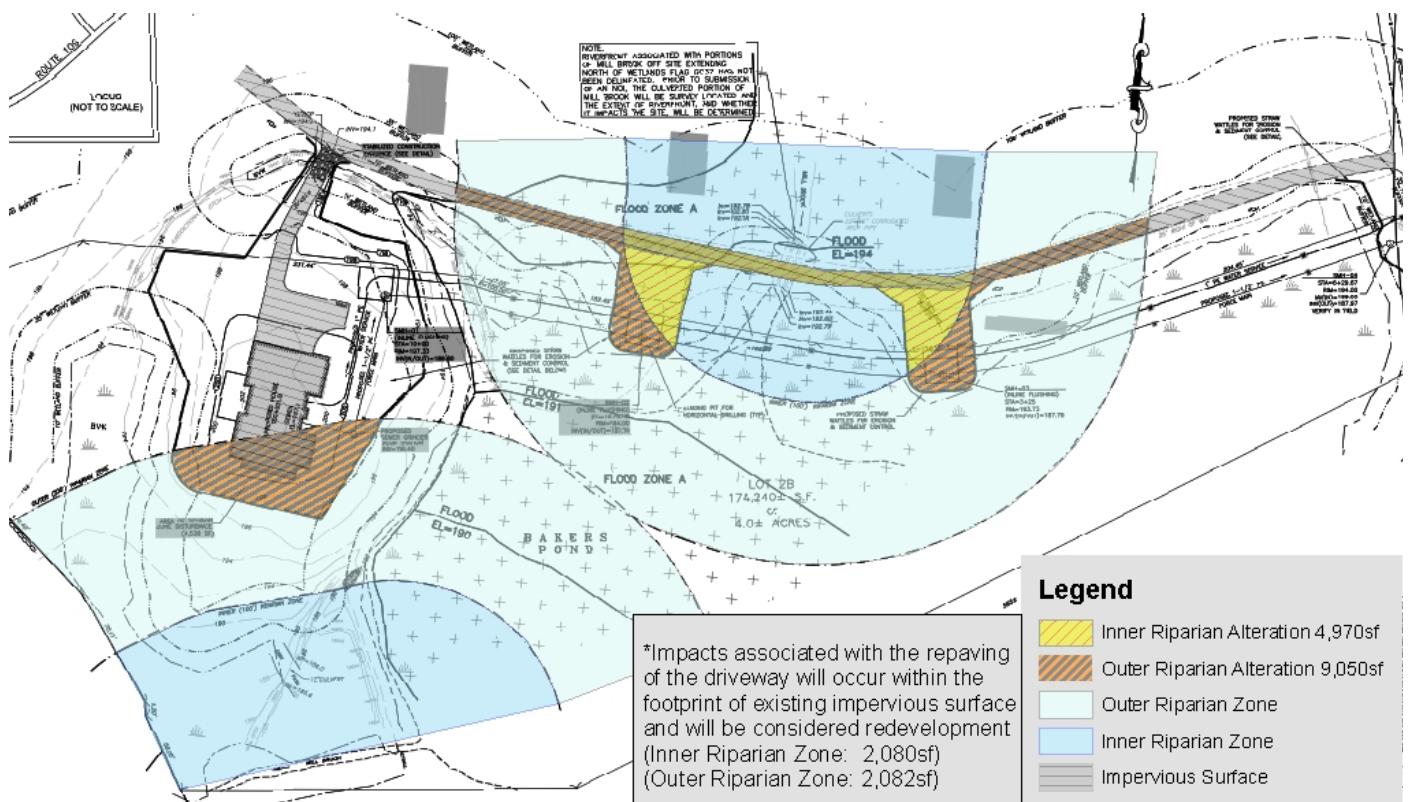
Impacts to the Inner and Outer Riparian Zones as a result of the proposed construction.
